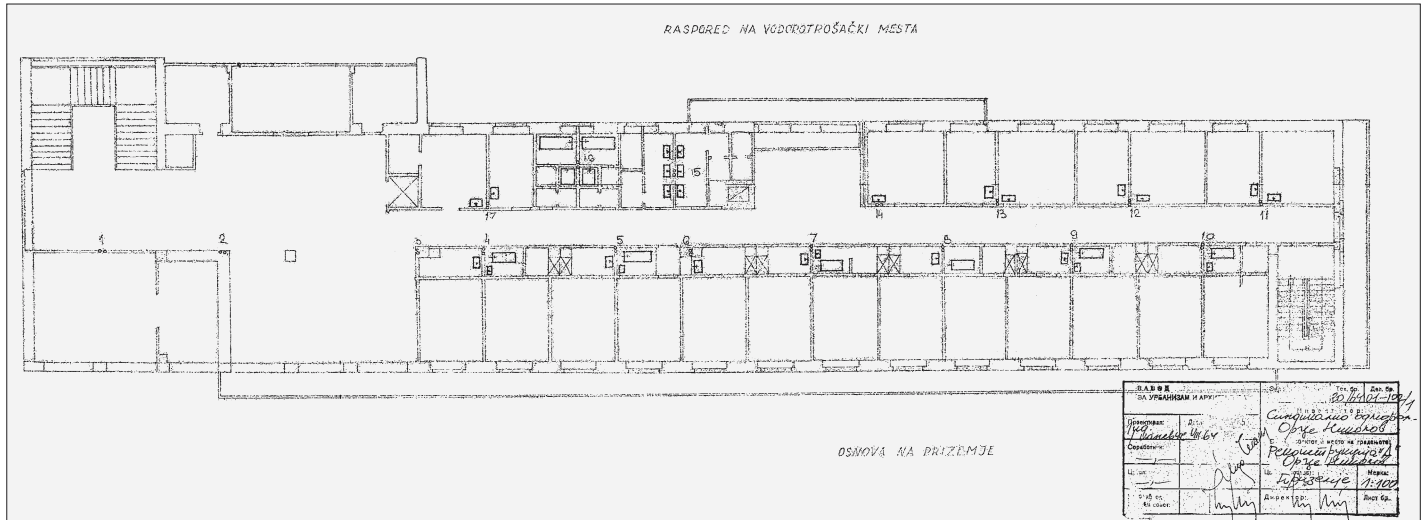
WORKERS' RESORT ORCE NIKOLOV, ACCOMMODATION BUILDING (A), DRAFTS FOR THE WATER SUPPLY, GROUND FLOOR PLAN, RECONSTRUCTION, 1964
